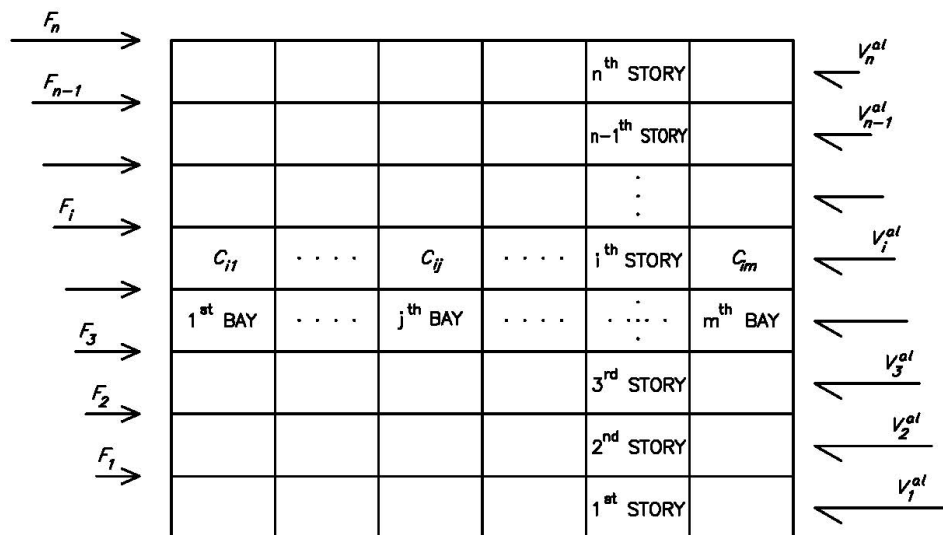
Multi-bay multi-story building subjected to in-plane loads.
